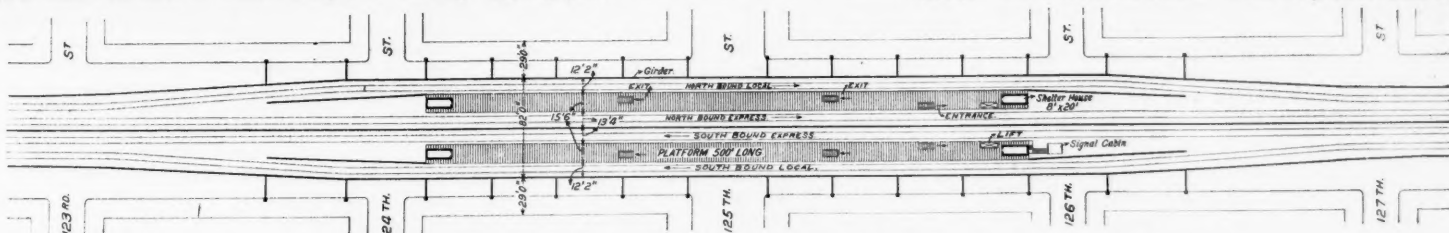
General Plan of Viaduct at 125th Street Station—New York Central Track Elevation in Park Avenue, New York.
